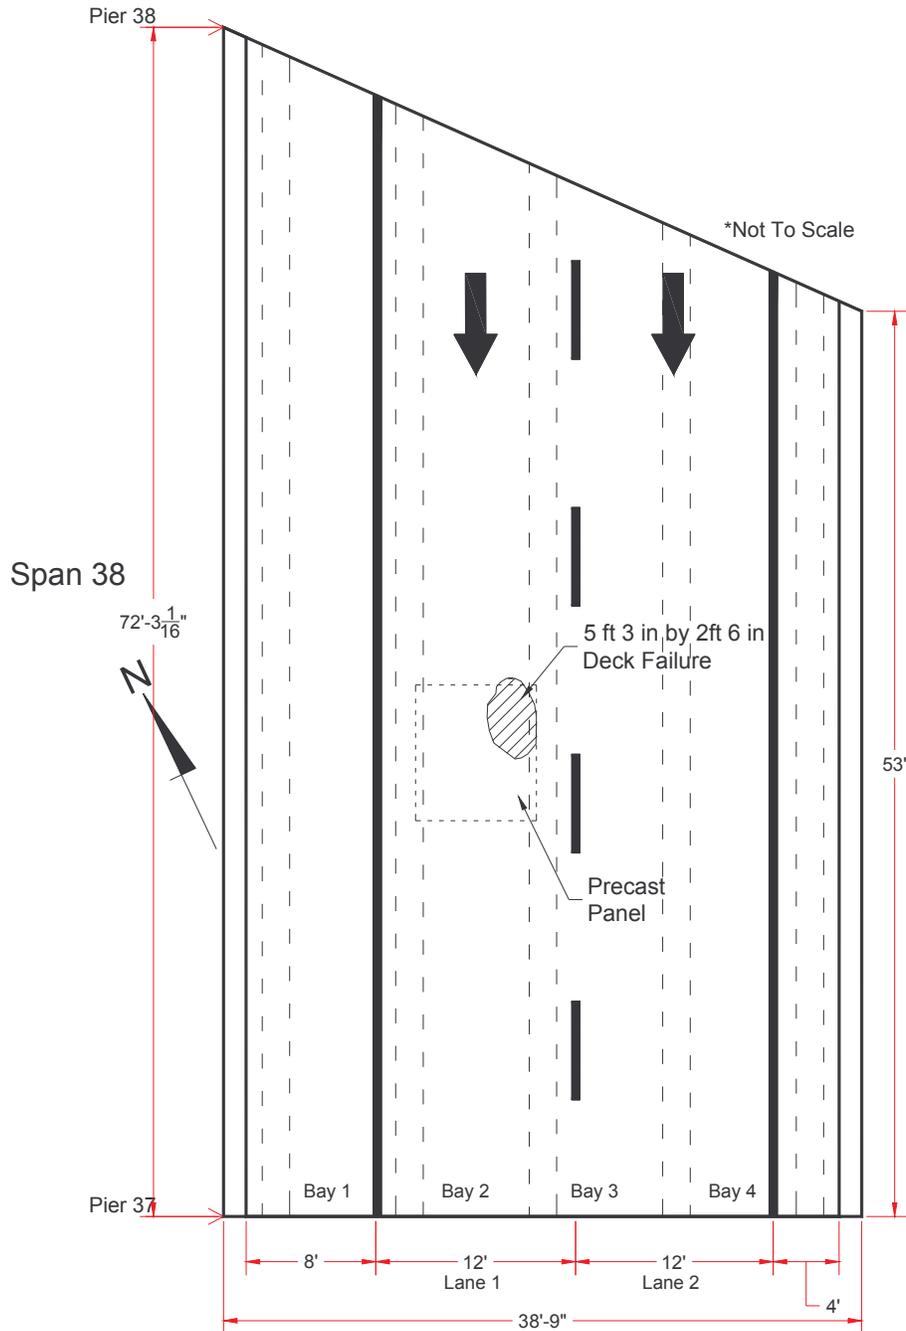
Location of Failed Panel, Bridge 100332 Span
